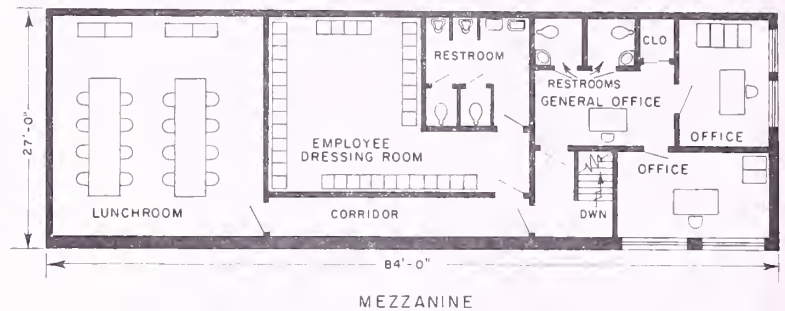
Layout for a dairy products-processing plant in a single-occupancy building.
